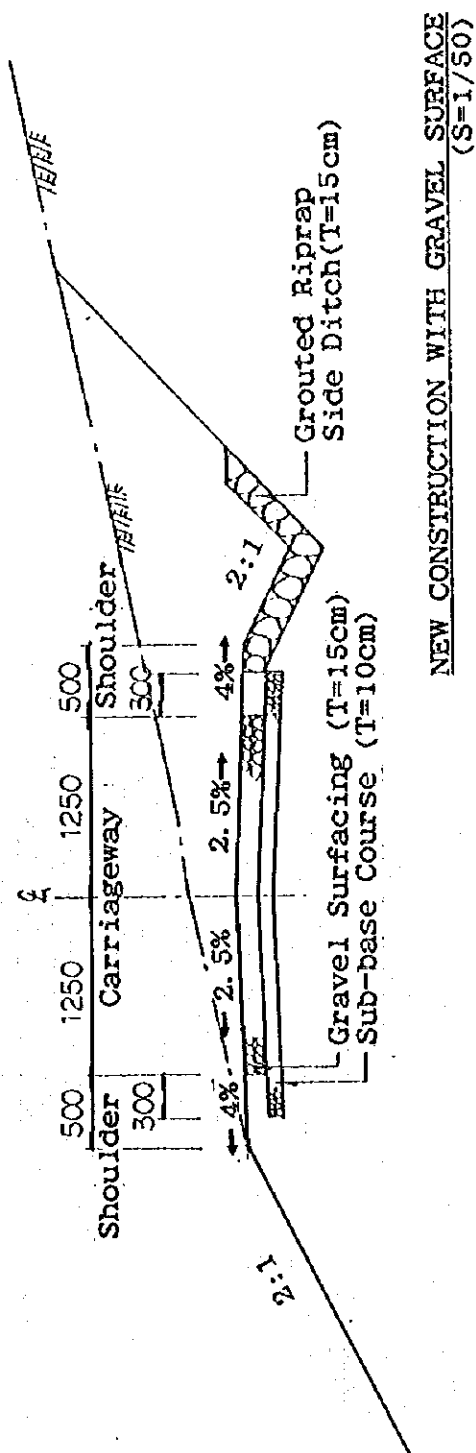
STANDARD CROSS SECTION OF FARM ROAD
